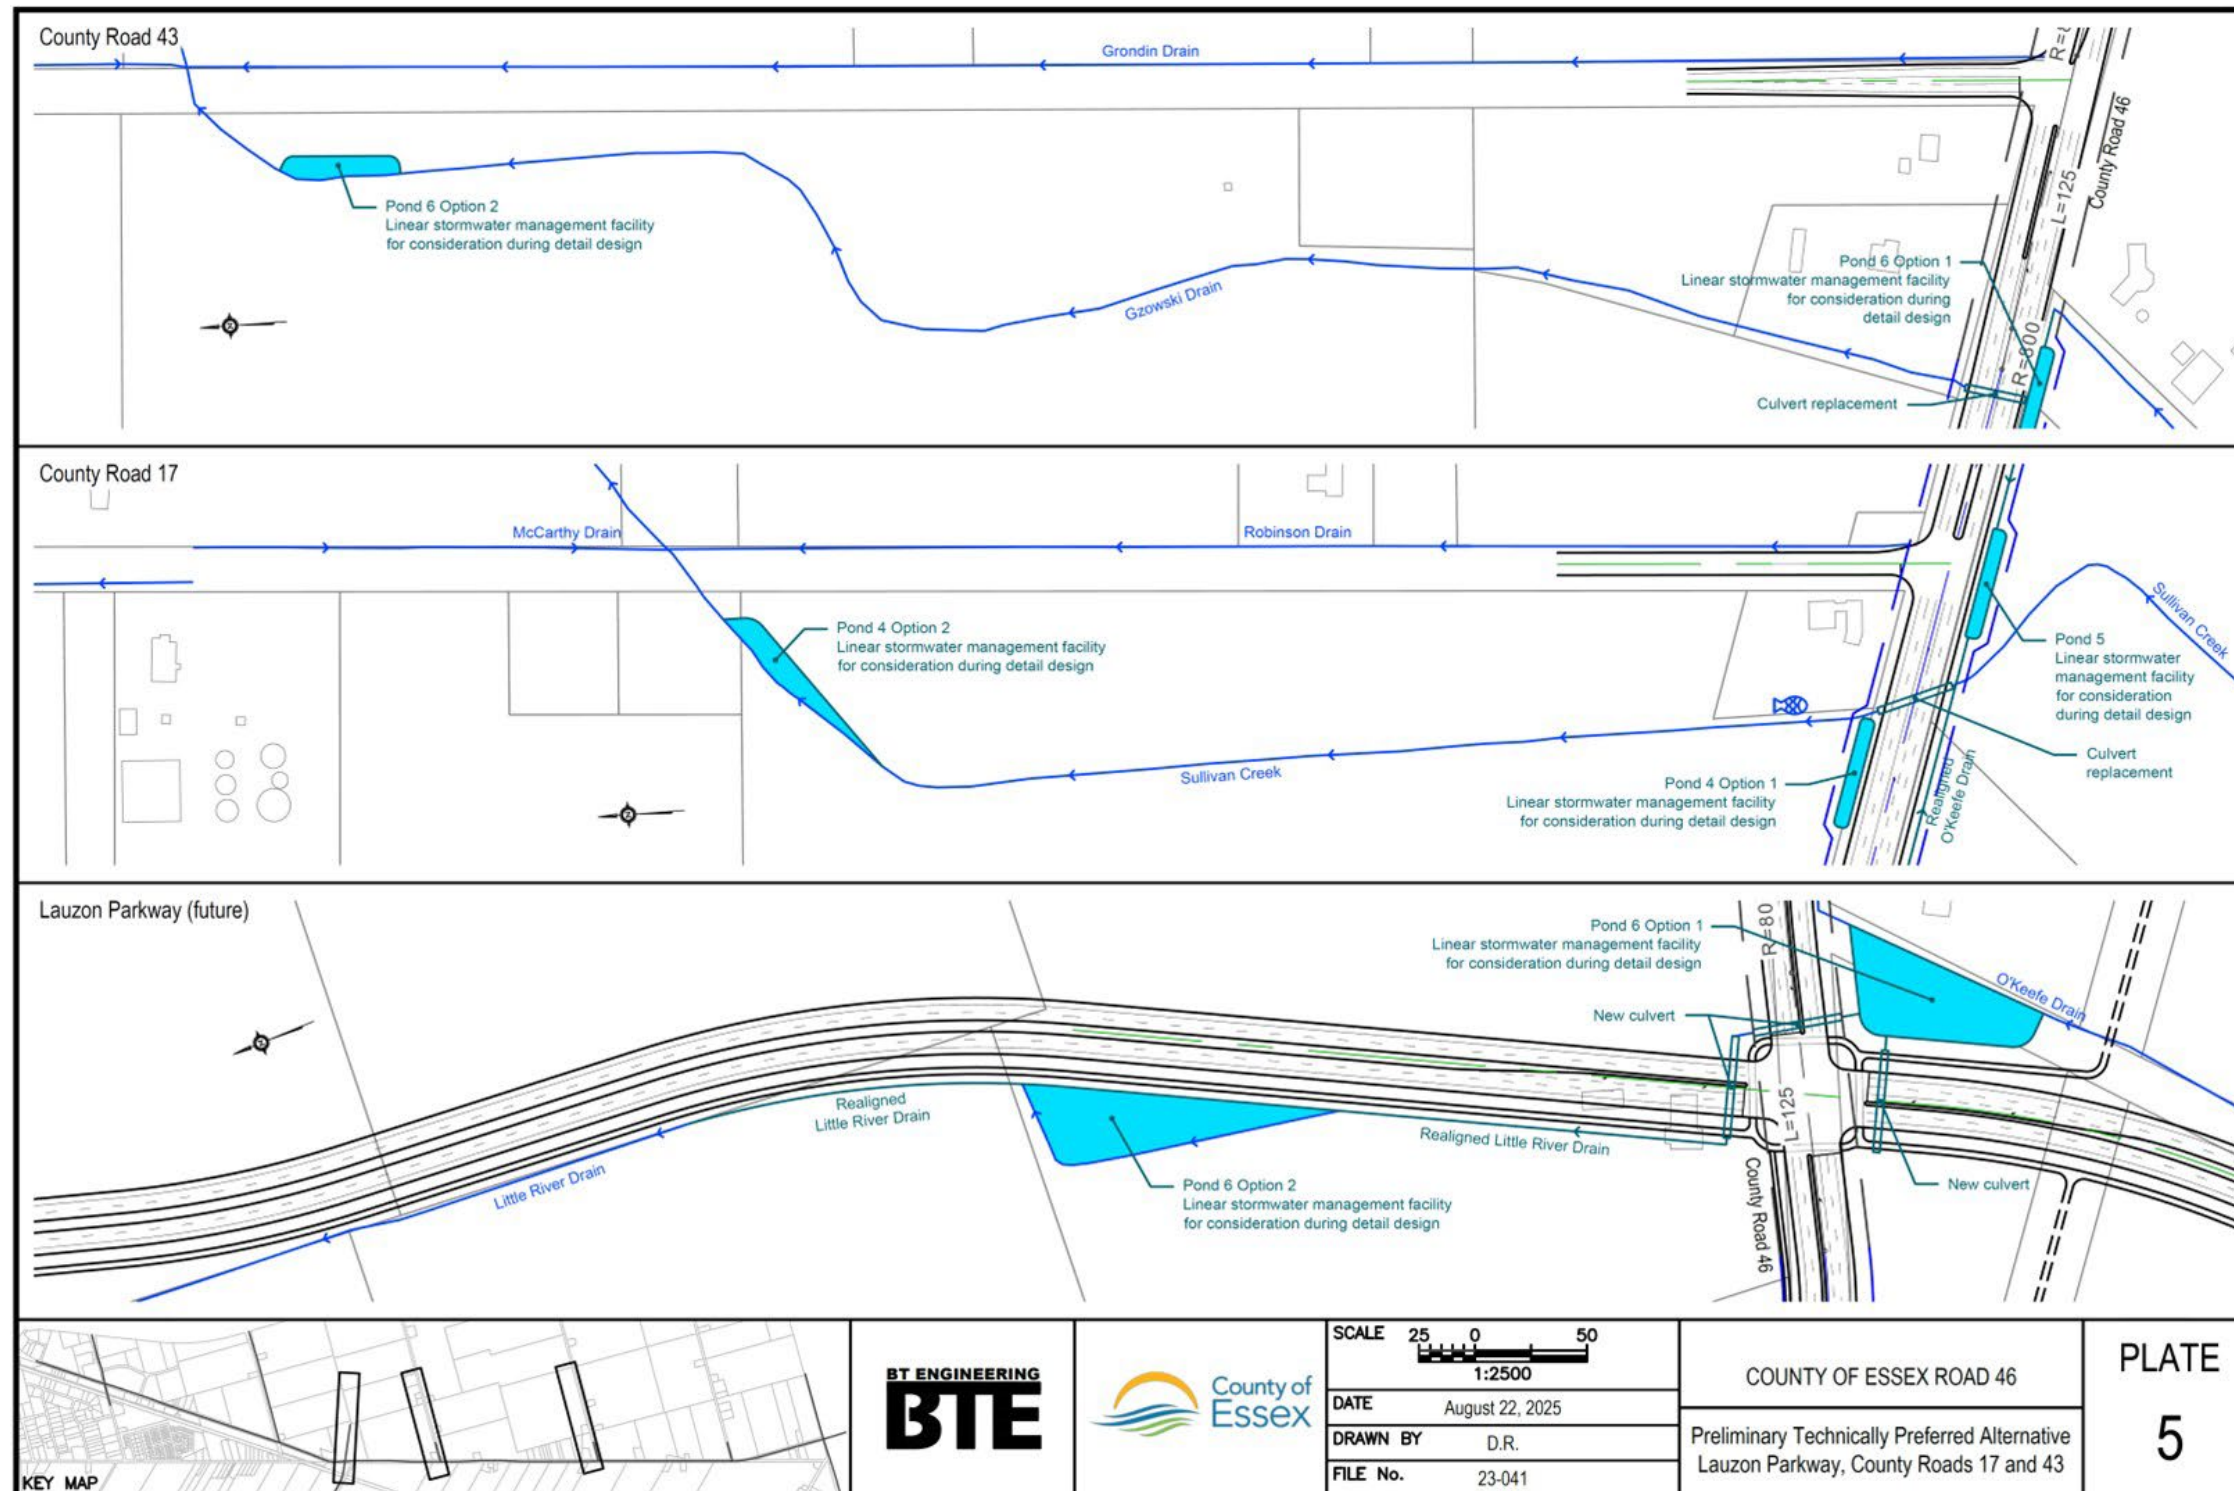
County Road 43, County Road 17 and Lauzon Parkway Recommended Plan
